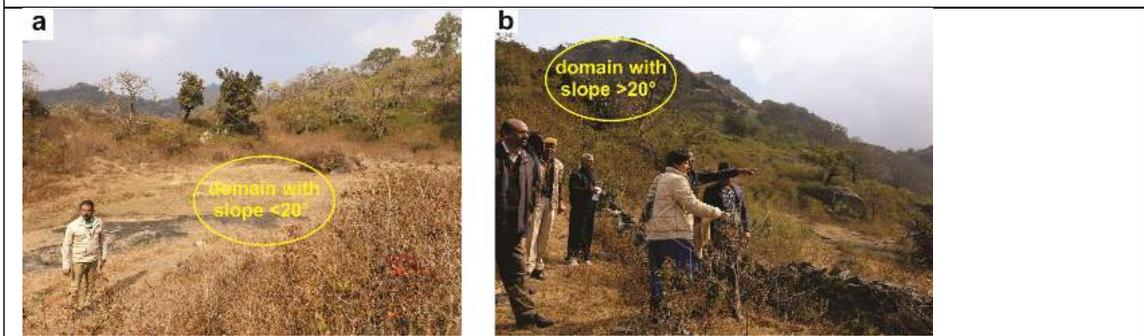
Proposed site for construction near STP Plant. (a) The low slope stable domain suitable
